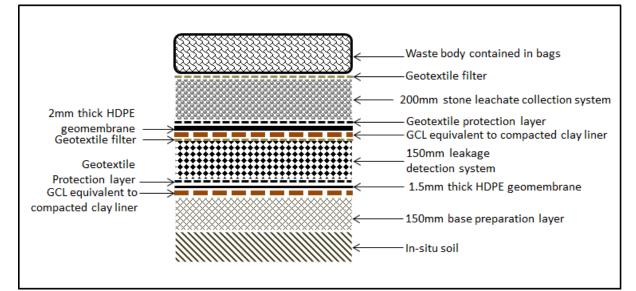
AN ILLUSTRATION OF THE CLASS A BARRIER SYSTEM TO BE INSTALLED FOR THE BHD SLURRY FACILITY (SLR, 2016)
